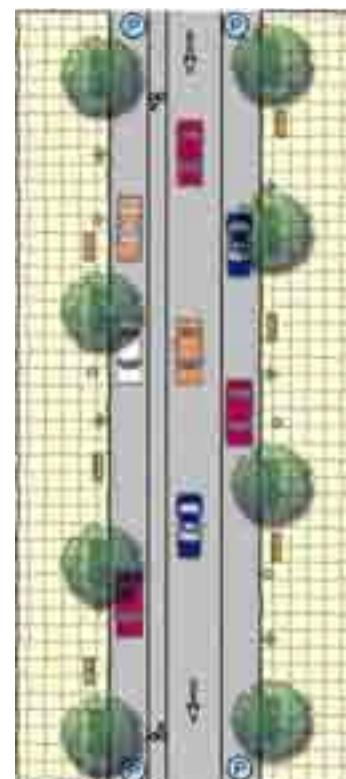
B - Typical Lane Configuration - R Street & Q Street West Side
